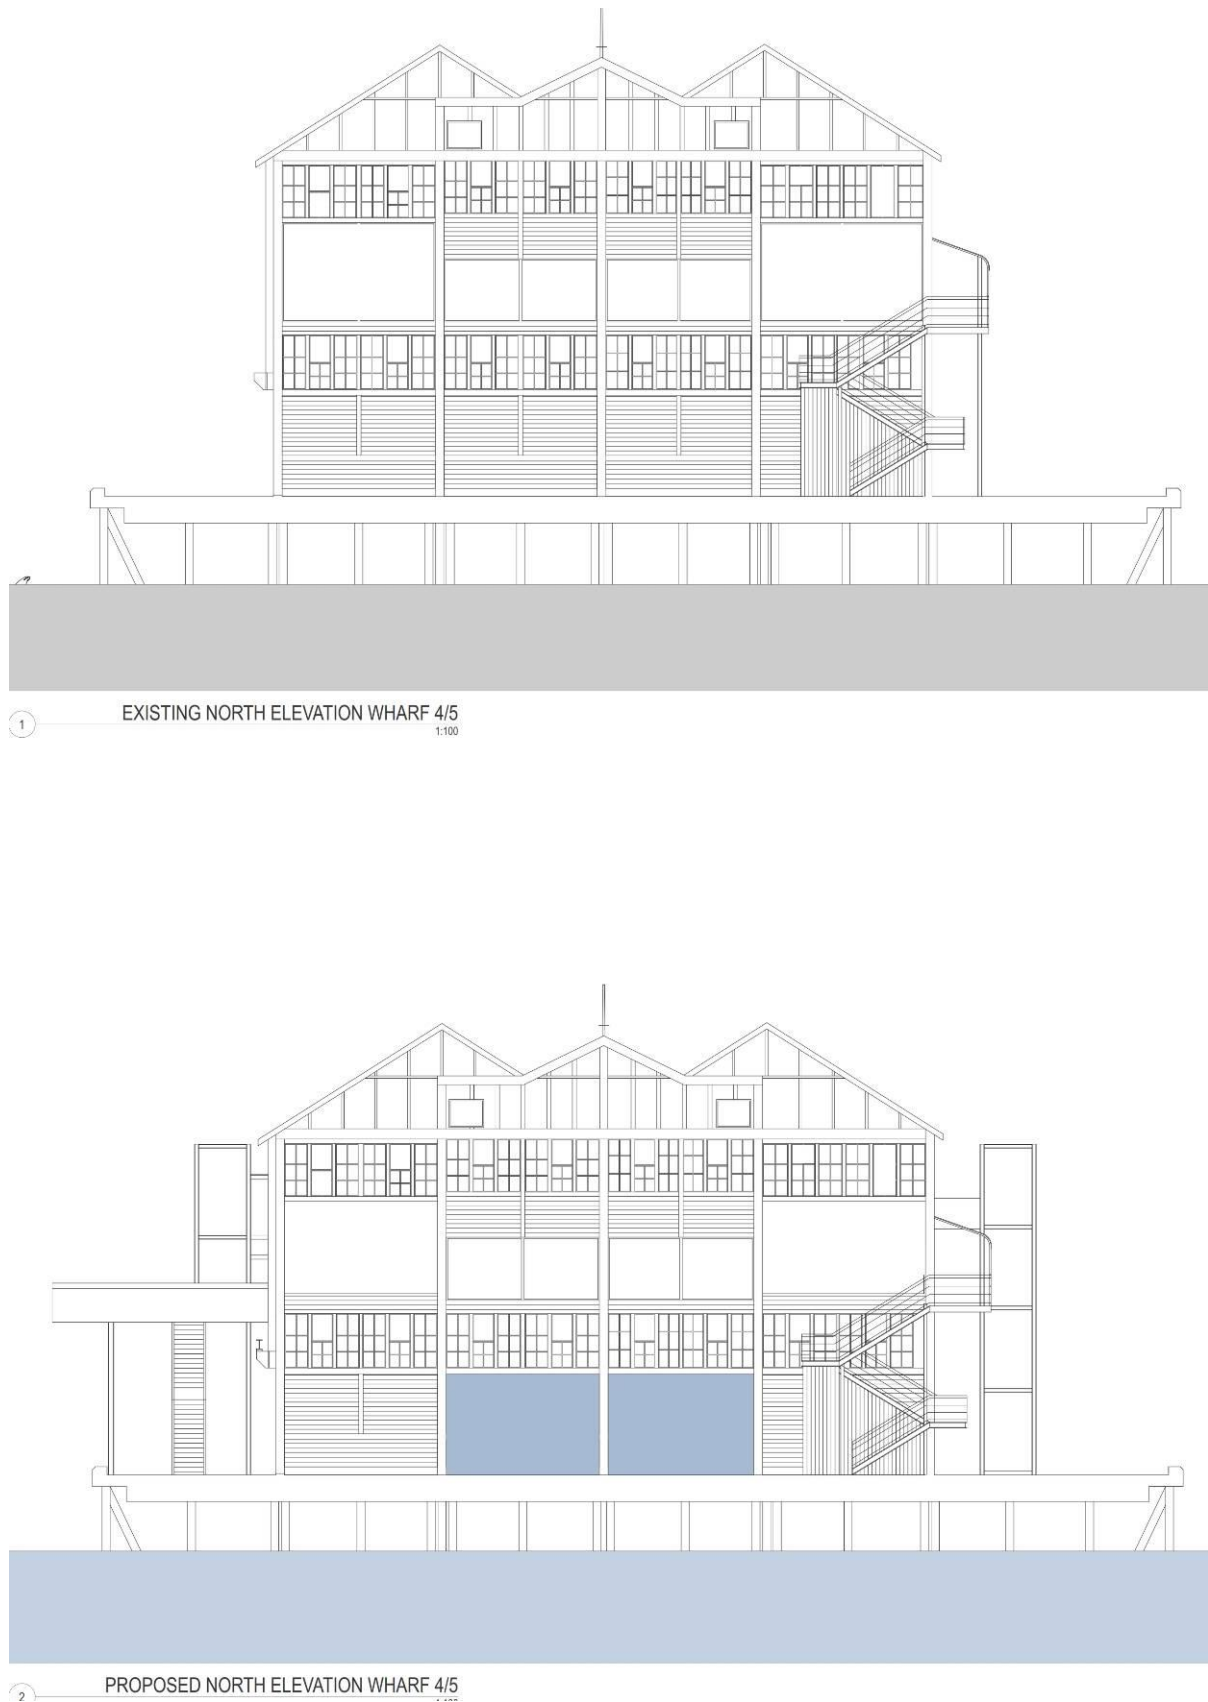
Wharf 4/5 North elevation Existing and Proposal of TZG Architects.
